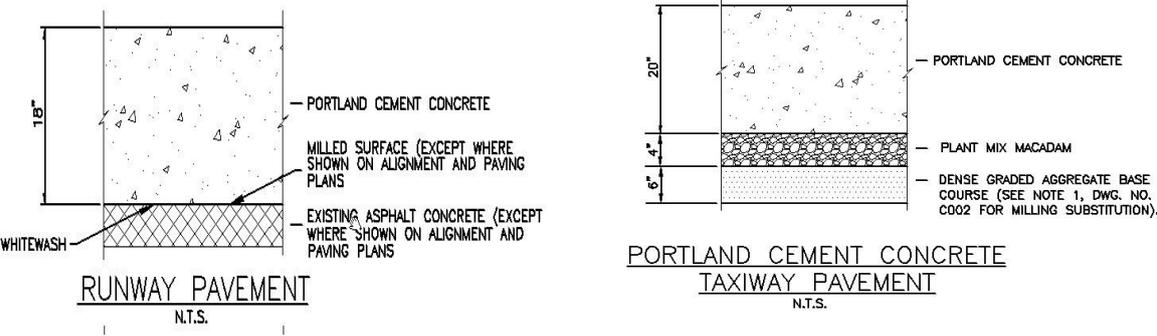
Runway and taxiway pavement cross sections. (1 inch = 2.54 cm)
